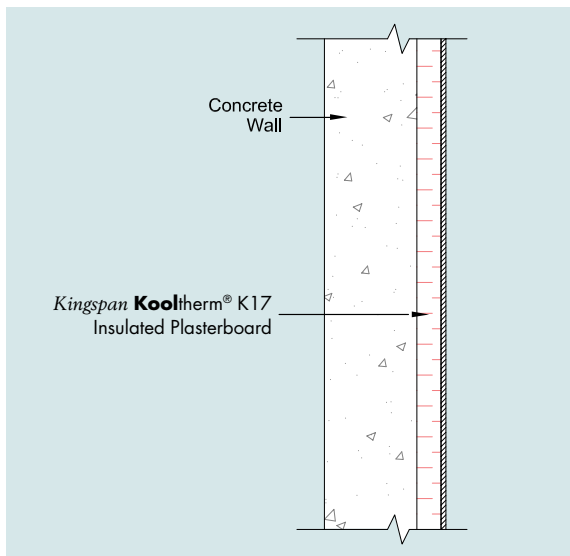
Side elevation - Concrete wall with Kingspan Kooltherm® K17 Insulated Plasterboard
